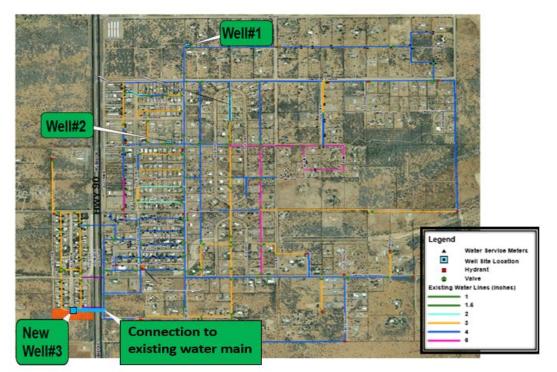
LOCATION OF DRINKING WATER SYSTEM INFRASTRUCTURE
